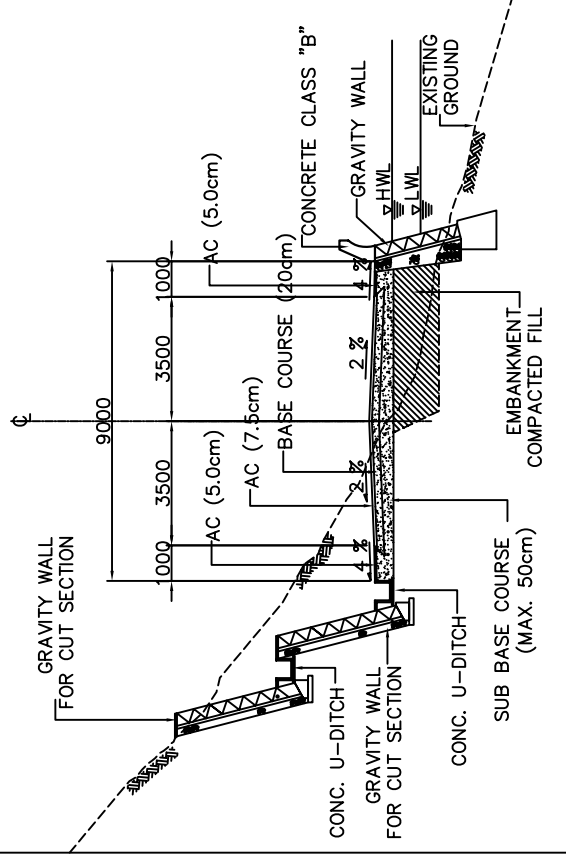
(3/5) TYPICAL CROSS SECTIONS
